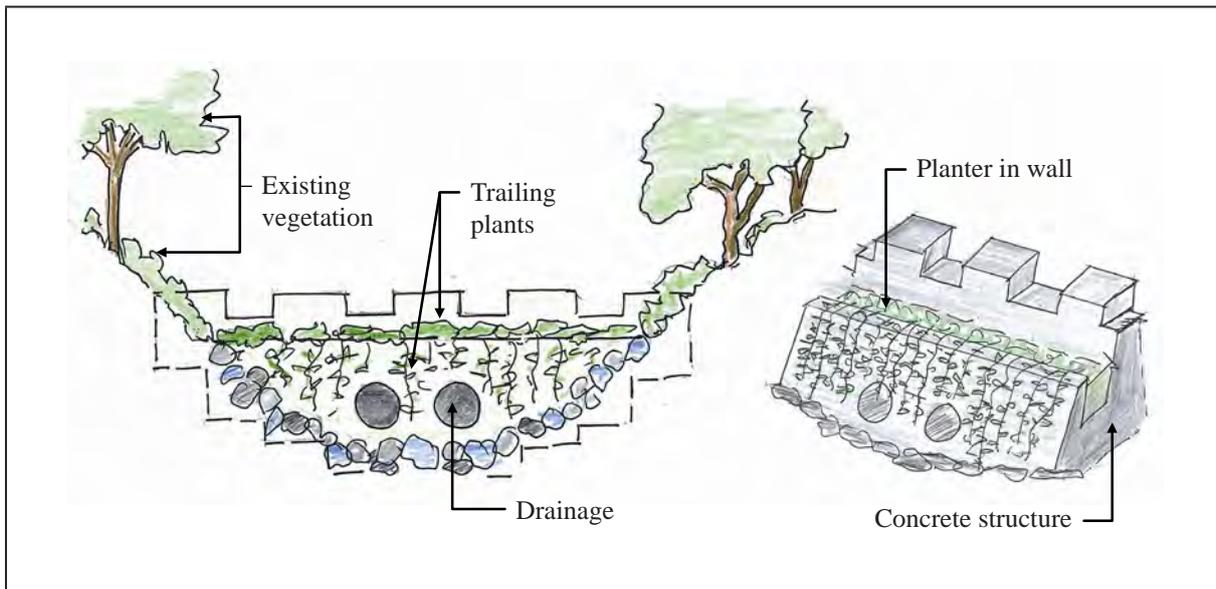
Schematic Arrangement for Greening a Rigid Barrier
